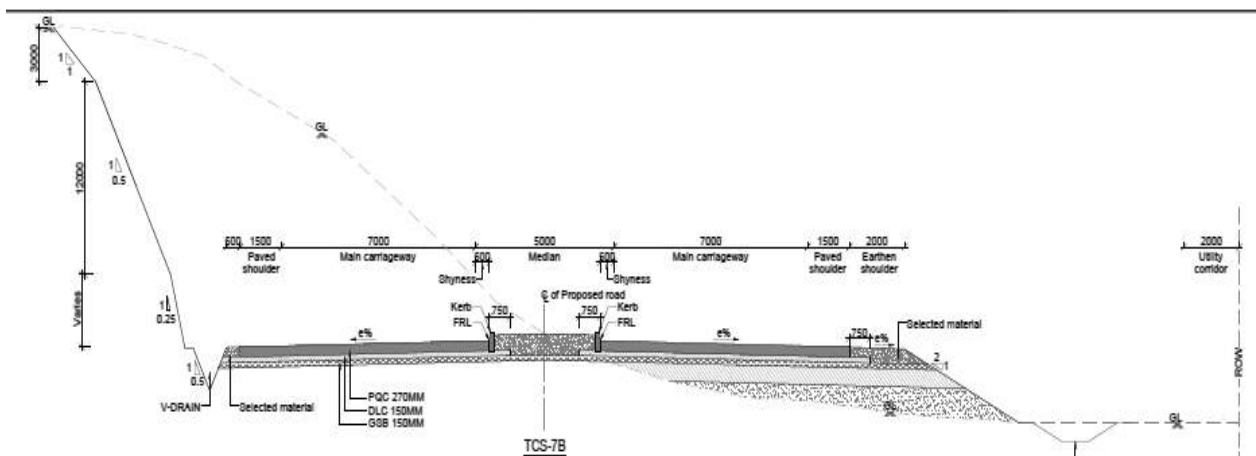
TCS-7B Typical Cross Section of 4-Lane Carriageway (One Side Cutting)
